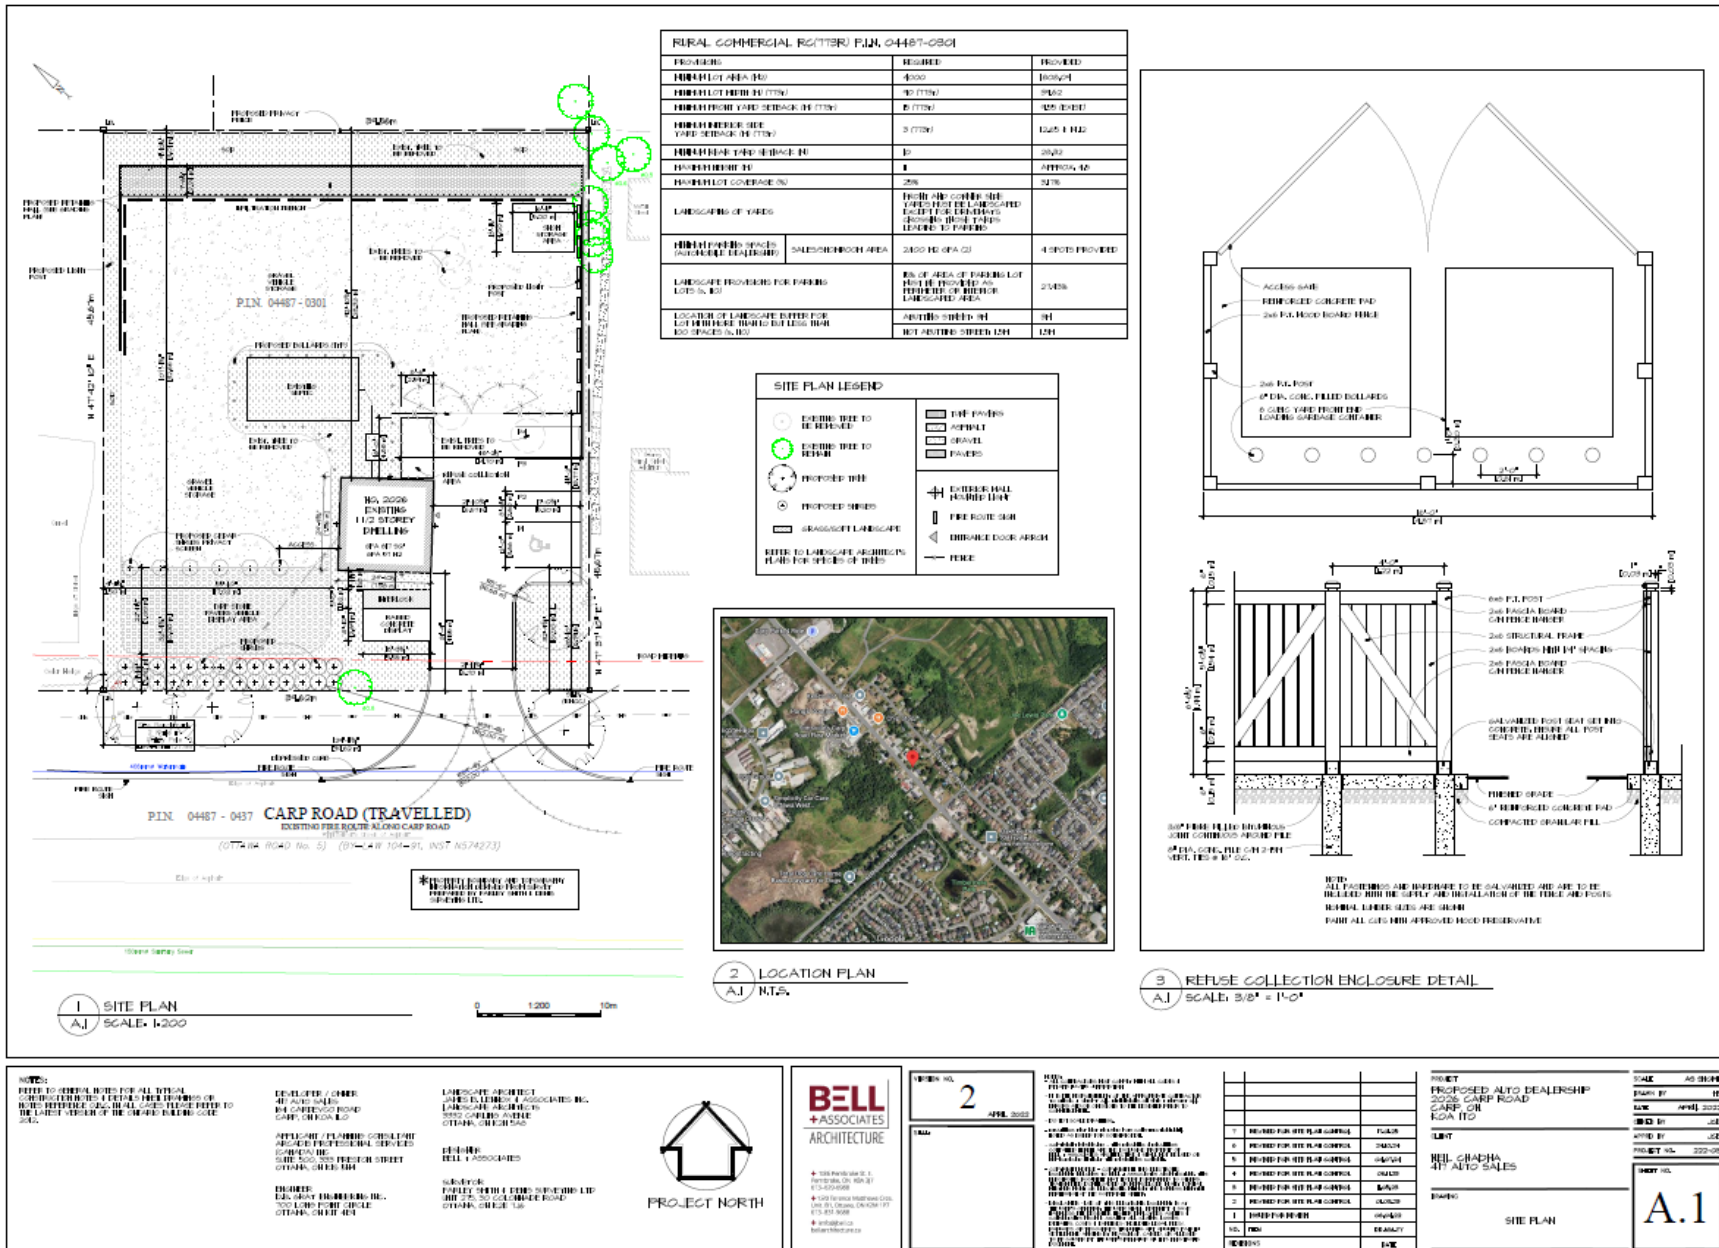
Proposed Site Plan prepared by Bell + Associates Architecture
